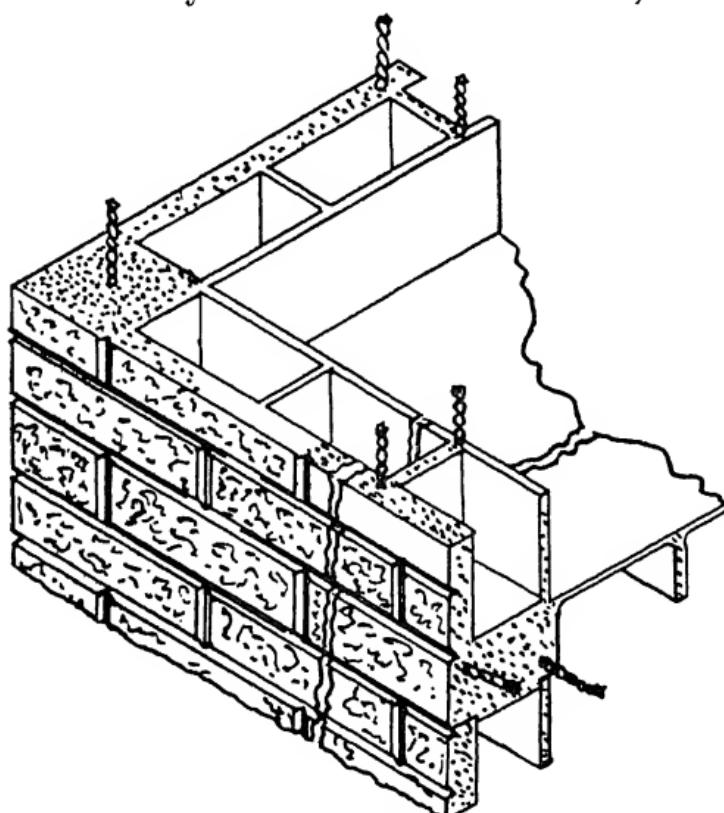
The Ransome System of Reinforced Concrete Walls.
